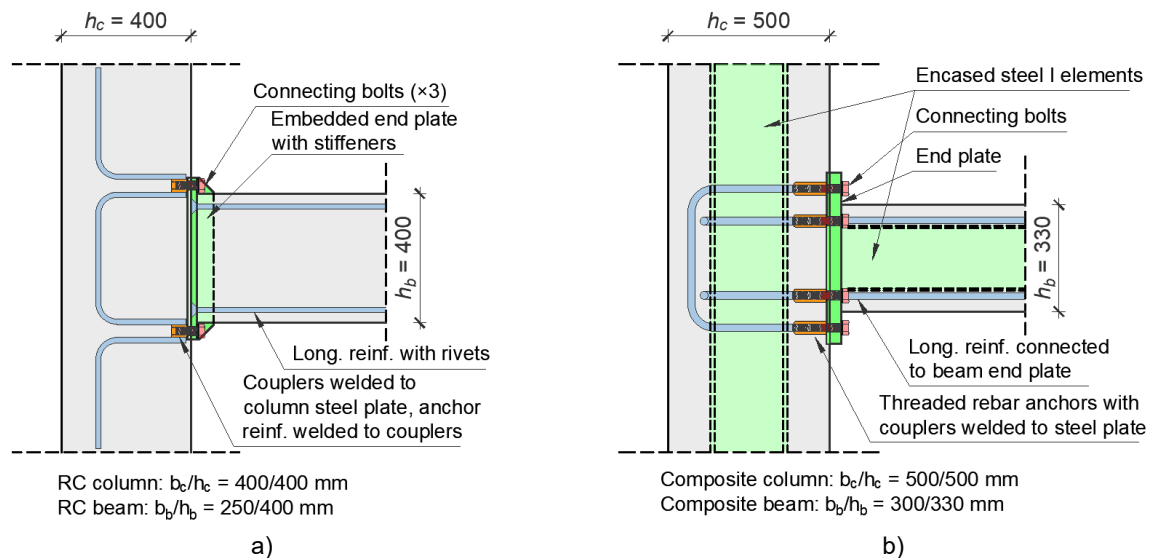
End plate connections in beam-to-column joints: (a) RC joint end plate and stiffeners (adapted from Senturk et al. [28]), (b) composite joint with extended end plate without stiffeners (adapted from Nzabonimpa et al. [29])
